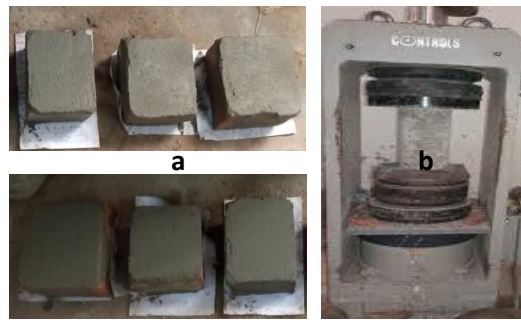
Cementing brick for drying (a) compressive strength test (b)
